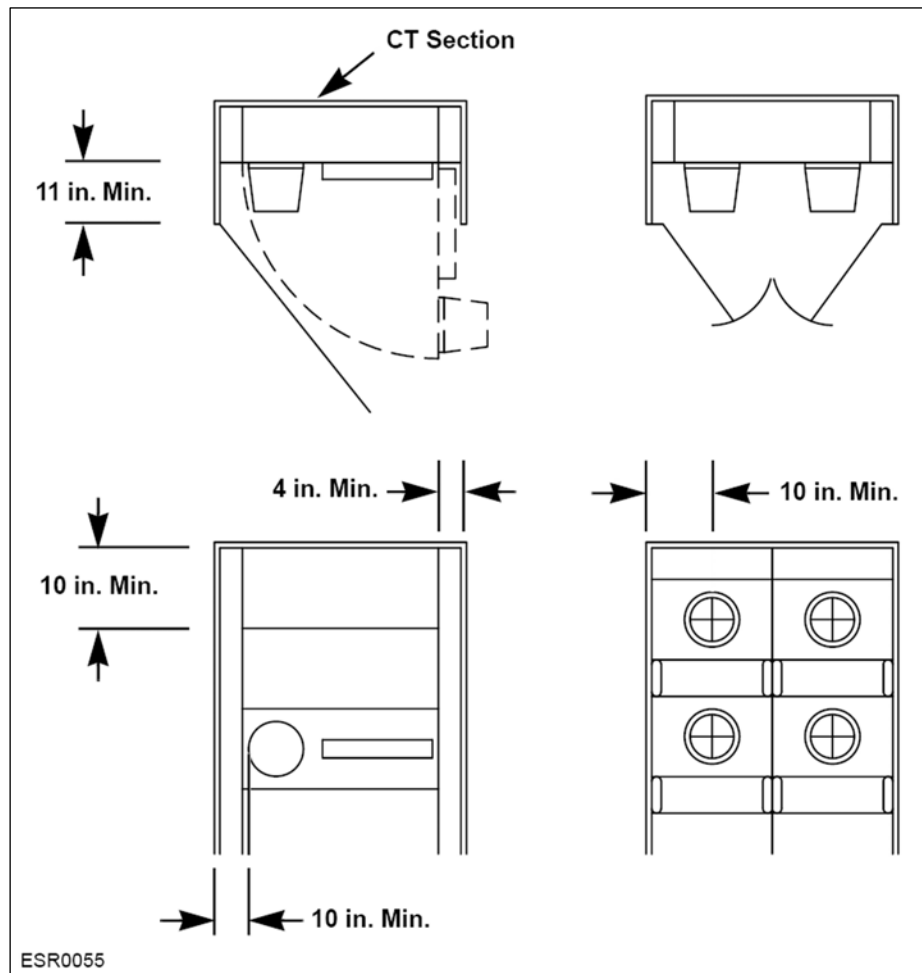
Outdoor Switchboard Metering (EUSERC 354)
